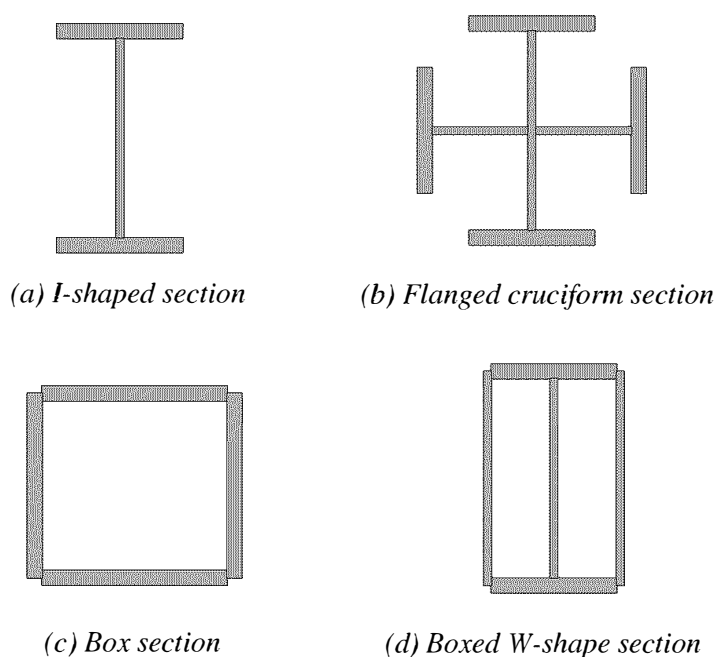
Column shapes. Plate preparation and welds are not shown.
